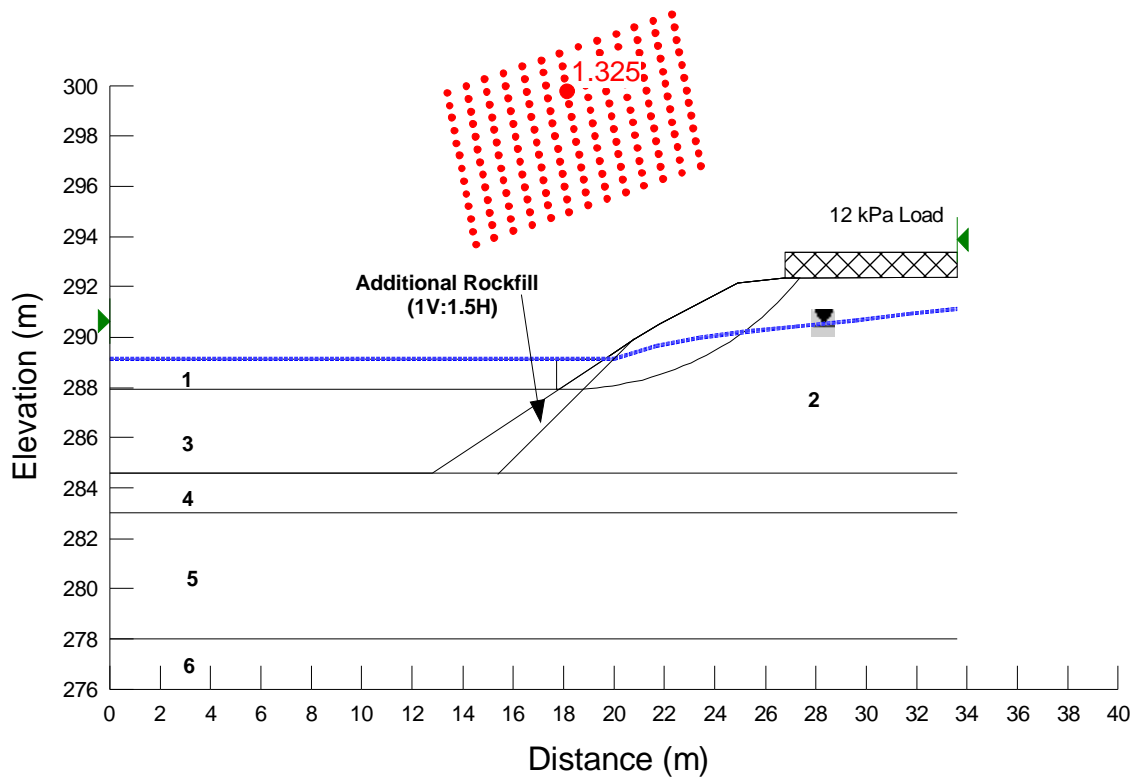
Stability of HWY11 Road Section at Sta. 14+900
